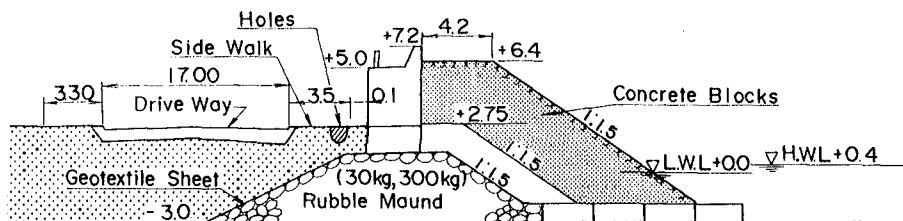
Cross section of a rubble mound type shallow water seawall.
